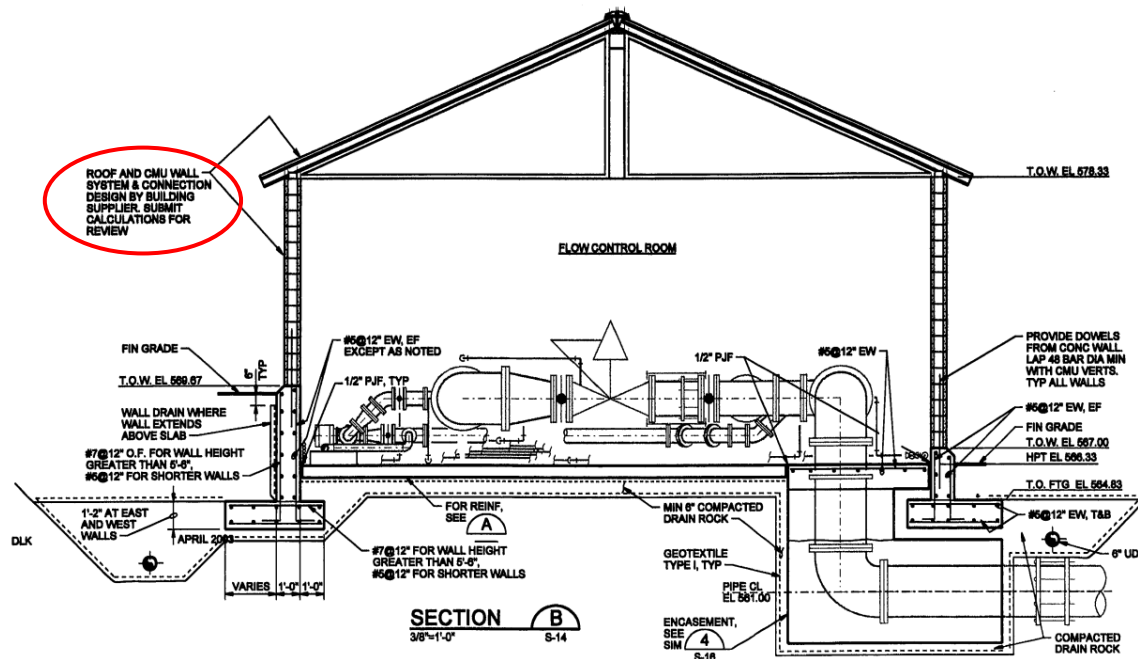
Design of Lone Oak Reservoir Control Building was a Deferred Submittal
